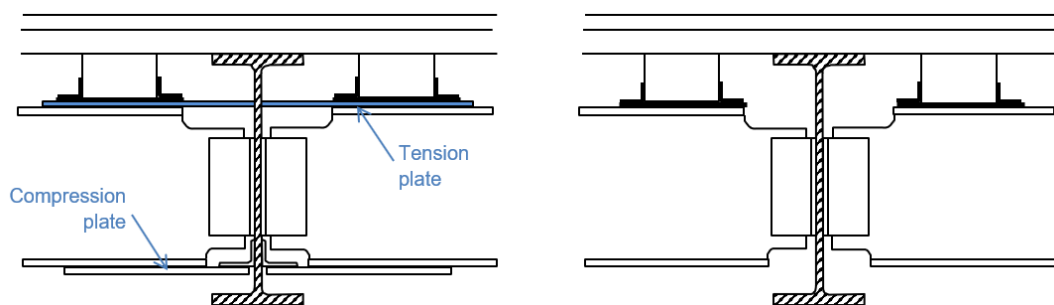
Cross-section of the connection with (left) and without (right) tension and compression plates [37].
